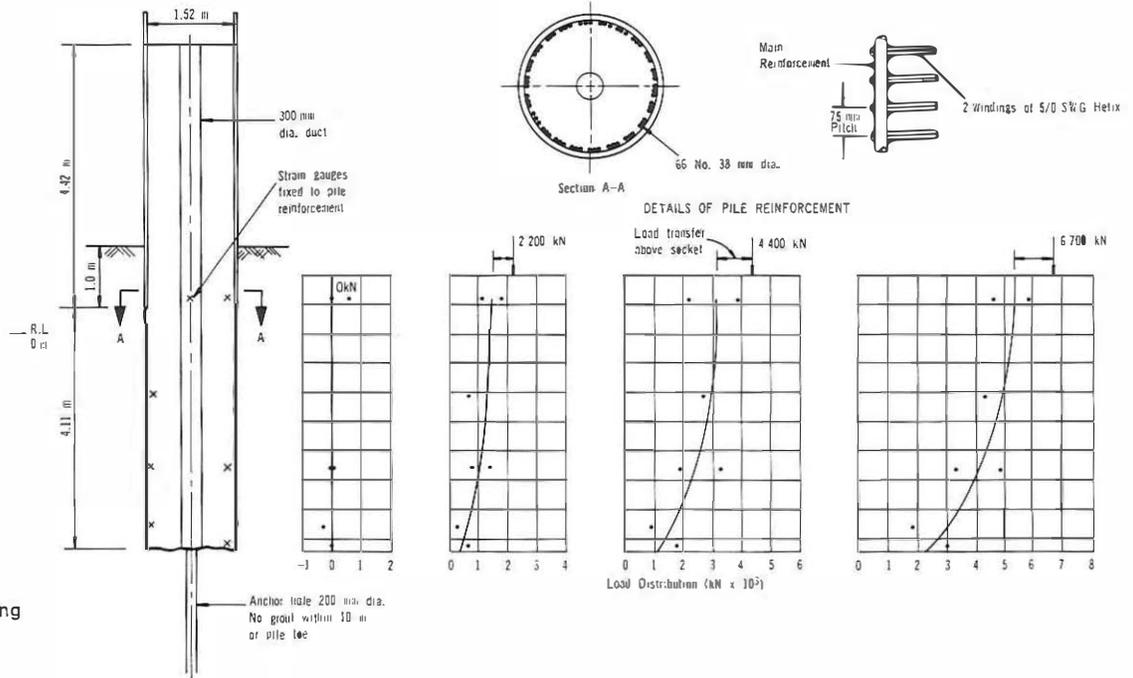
Eastern Freeway, Yarra river bridges—proof loading of cylinder 6, load distribution.
